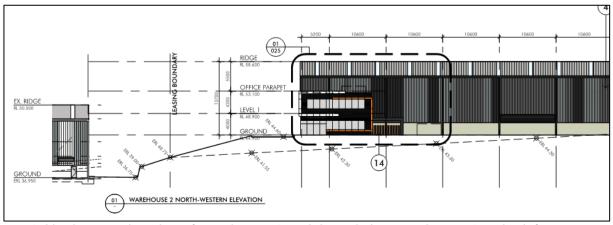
North-west elevation of warehouse 2 and the existing warehouse 1 to the left.
